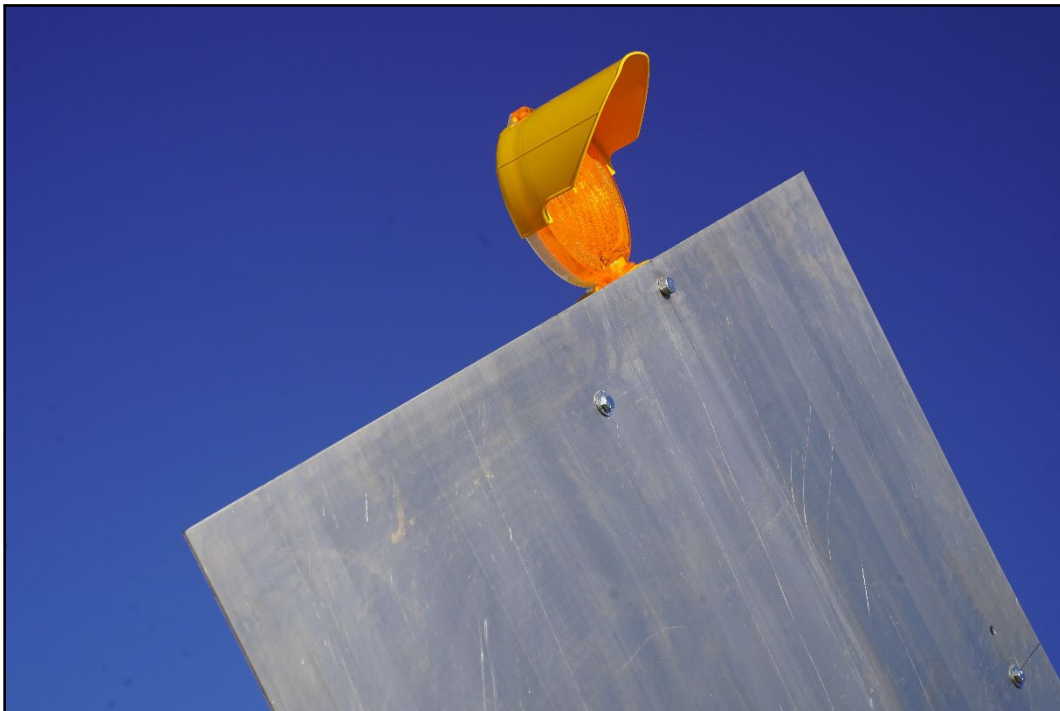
Details of Type III Barricade with Mounted Sign.
